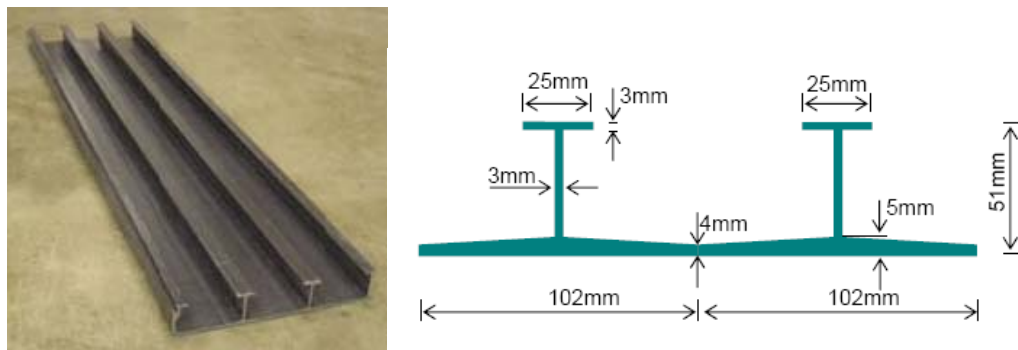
Pultruded FRP Plank having T-upstand ribs (Bank *et al.* 2007)
